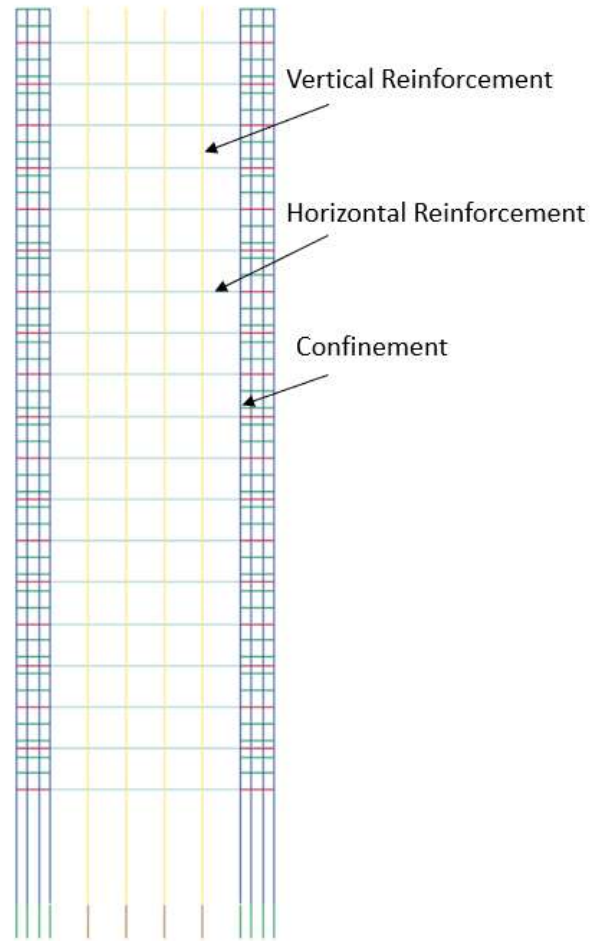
Reinforcement Layout for In-plane loaded walls
